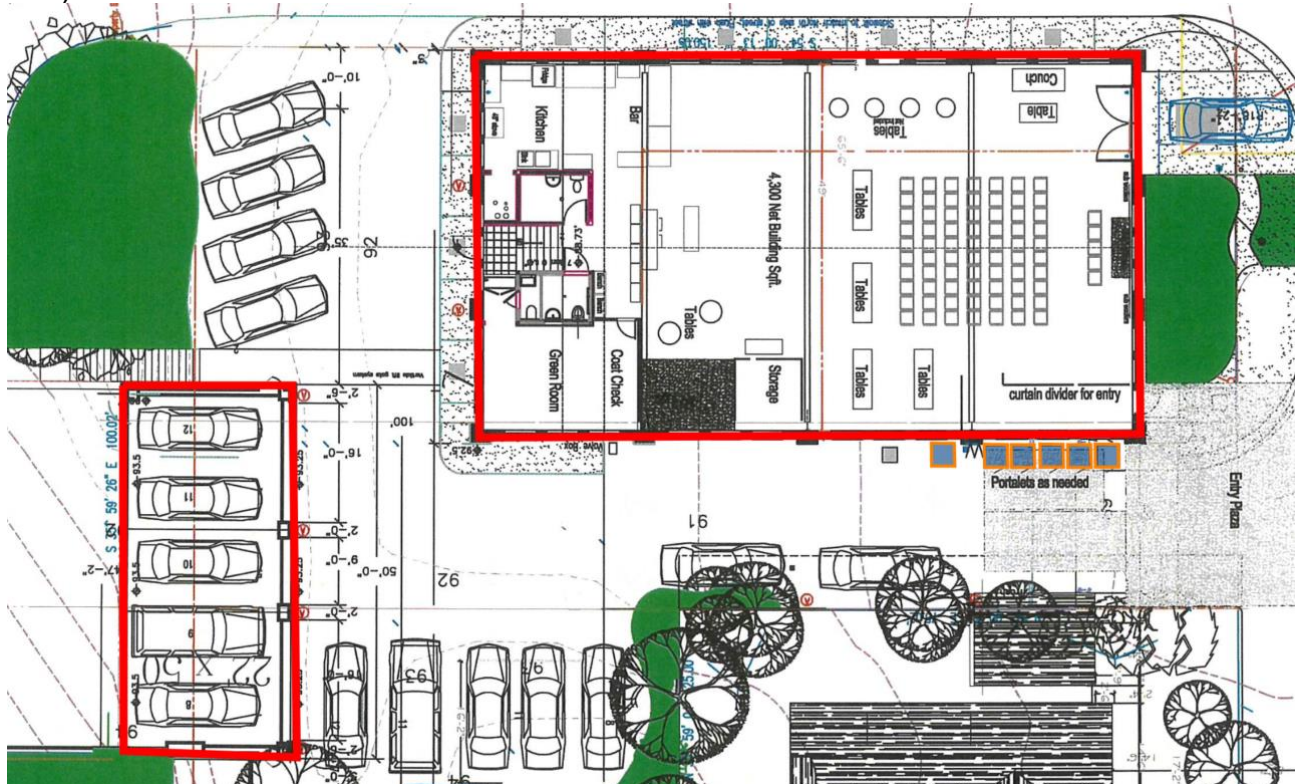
Applicant's Site Plan, Main Structure and Garage Highlighted in Red, Portable Toilets Highlighted in Orange. 12th Street to the North and Woodside to the east of the Structure.
